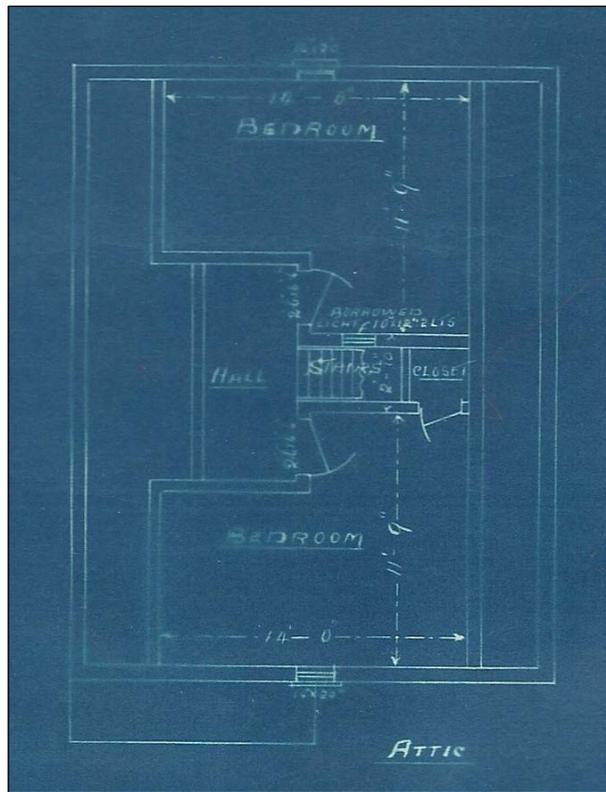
Architect's Plans, Blais House, "Attic". (Courtesy of owner.)
